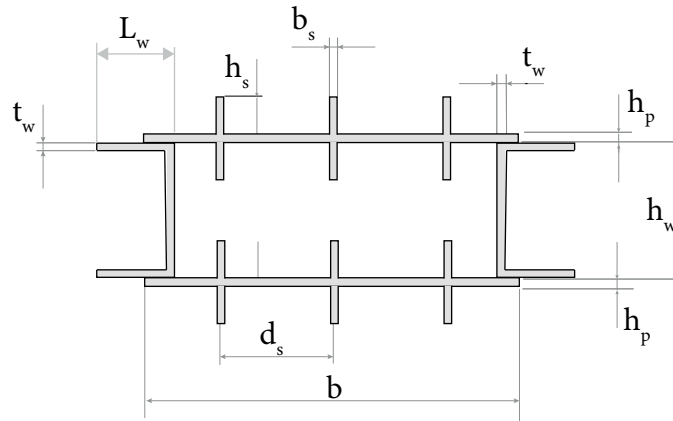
Exemplification of the beam's cross section considered in [125].
